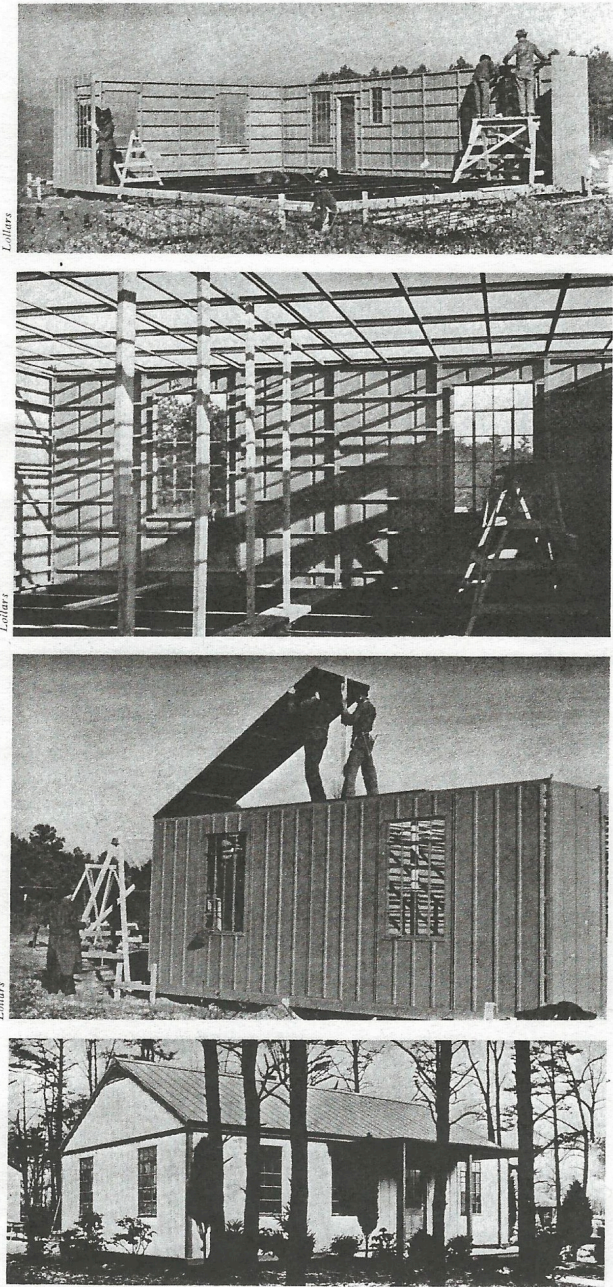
Tennessee Coal, Iron & Railroad Company, Prefabricated Farm Buildings. Published in “Steel-Panel Prefabricated Farm Buildings Erected in the South,” *Architectural Record* 85 (January 1939): 38.
